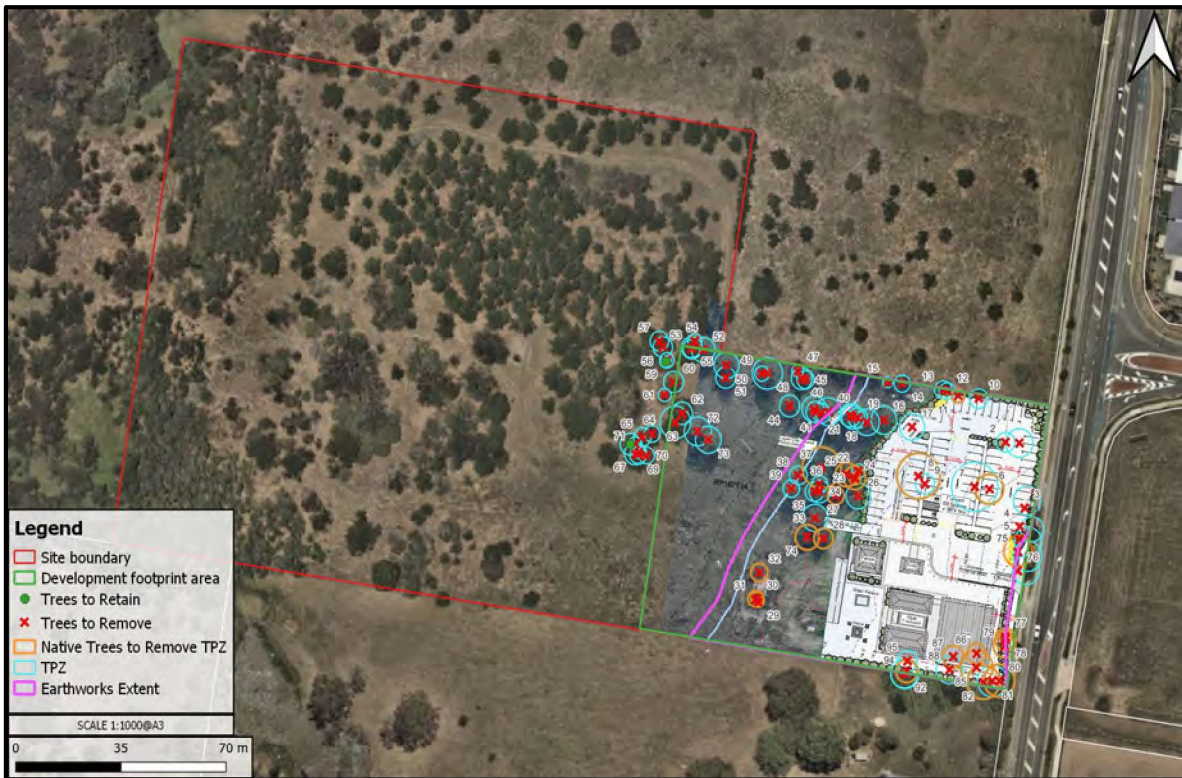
Proposed Site Plan and Tree Survey (source: Elevation Architecture, 1333-02, A-DA-01.01, Rev E, 20/02/25).
